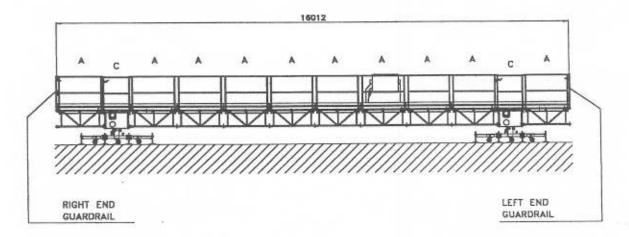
Twin-mast platform - erection stage 7 9 - If the distance between the work deck and the wall exceeds 300 mm (0.98 feet). insert the columns for the "wall side" guard-rails (see point 5.3). These consist of tubular uprights with
